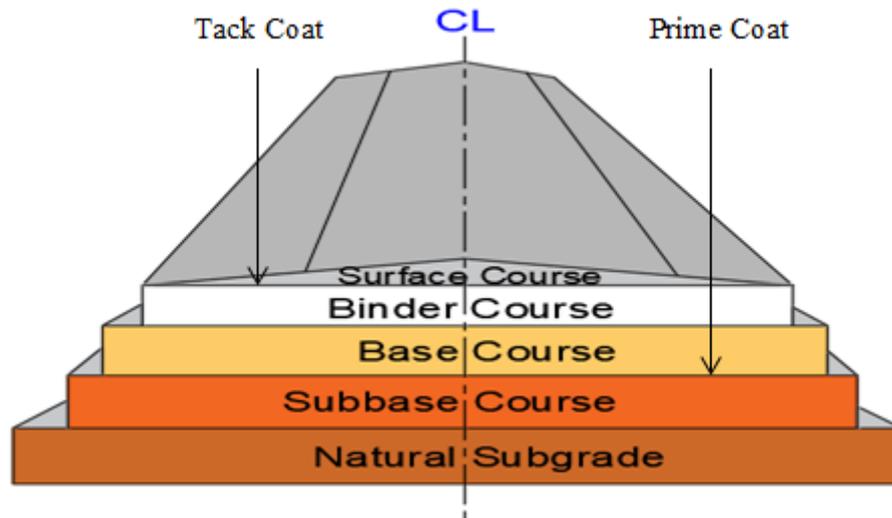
Typical Cross-Section of the Flexible Pavement Layers.
